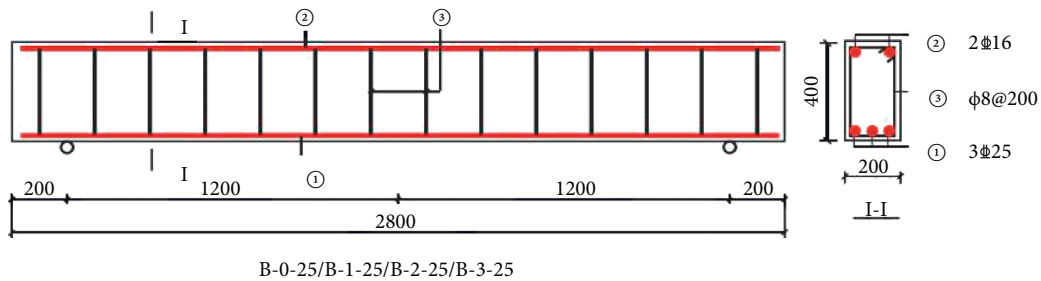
Dimensions and reinforcement layout of RC and SFRC beams [10].
